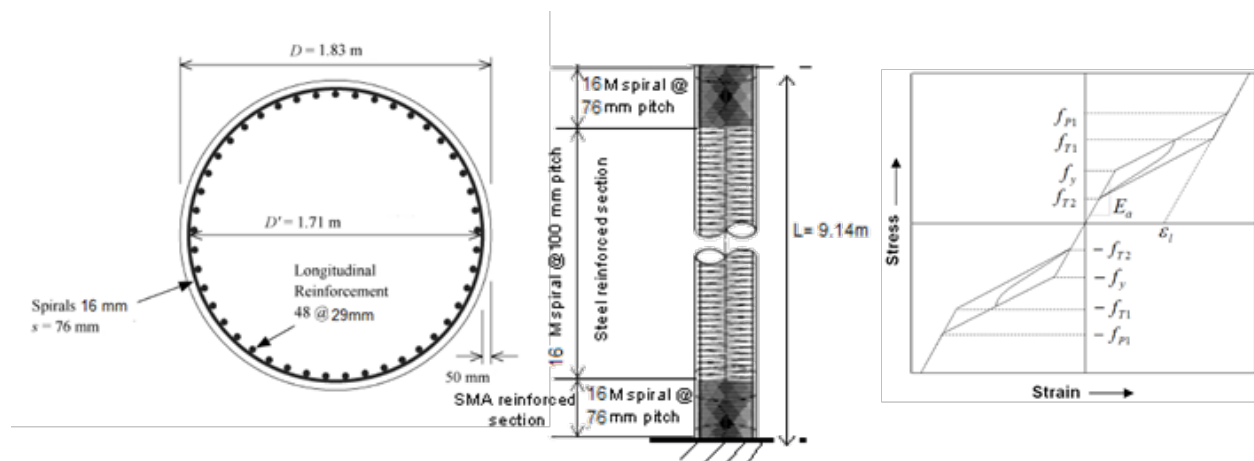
(a) Cross section, (b) elevation of SMA reinforced concrete bridge pier and (c) stress-strain relation of SMA rebar
